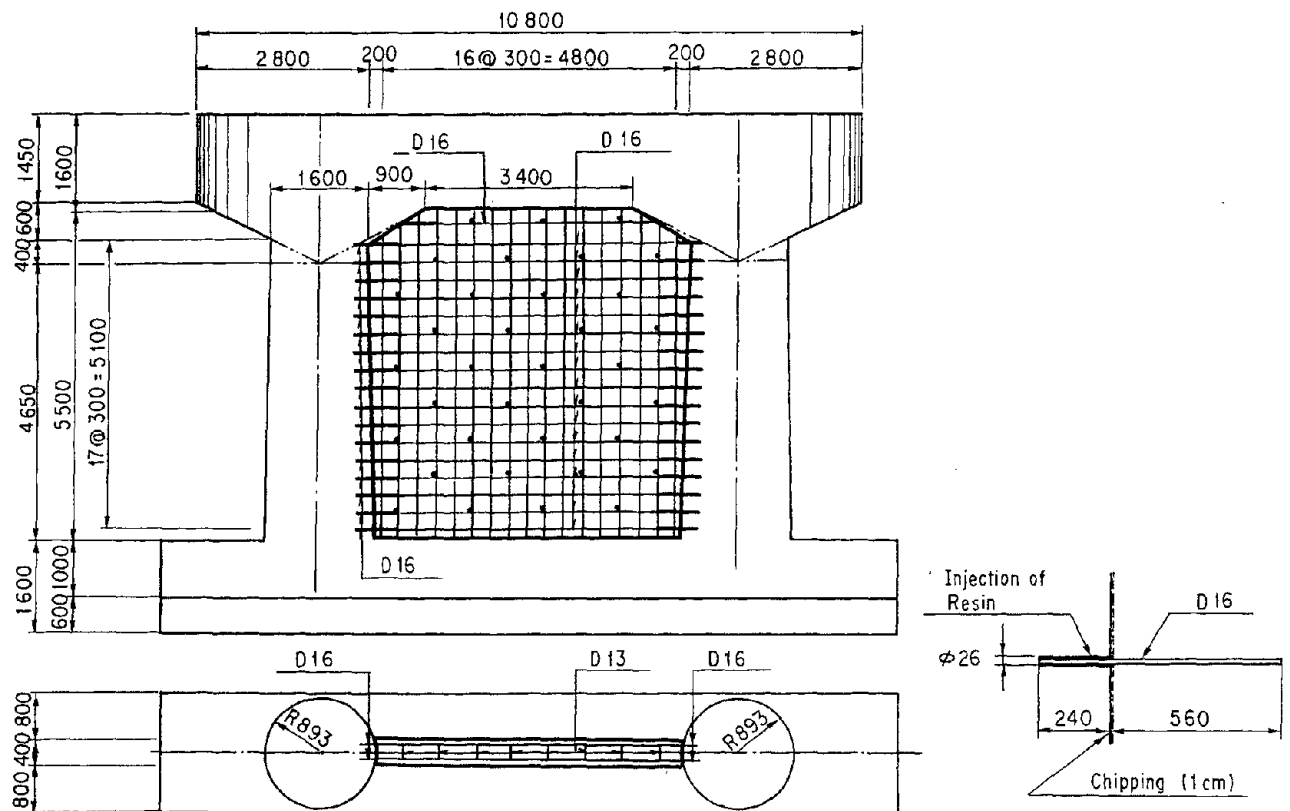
Seismic Strengthening of A Reinforced Concrete Frame by Placing A New Reinforced Concrete Wall
